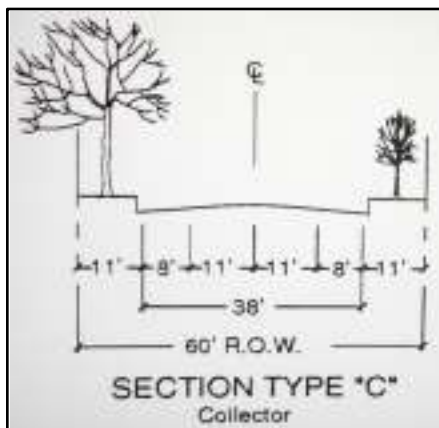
Typical collector as recommended in the 1995 Thoroughfare Plan
